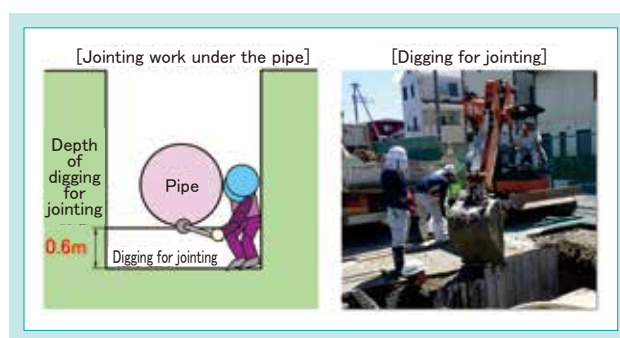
Pipe Jointing Beneath the Pipe and Joint Excavation
